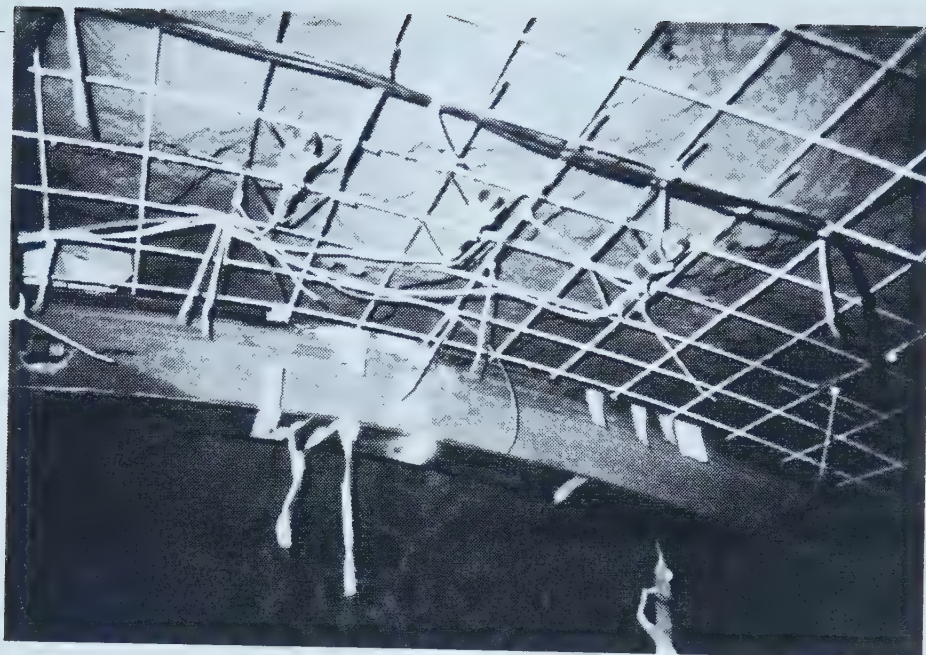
View of Compression Gages Fixed to Steel Mesh
